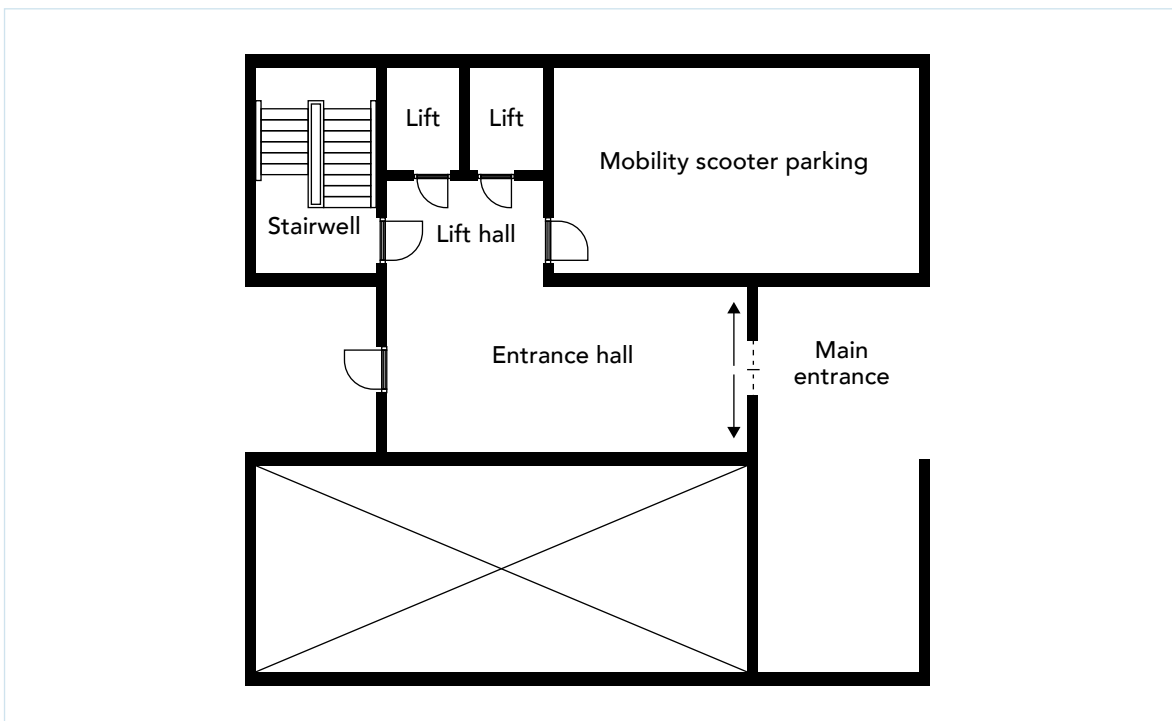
Schematic floor plan of the entrance hall to the block of flats.
